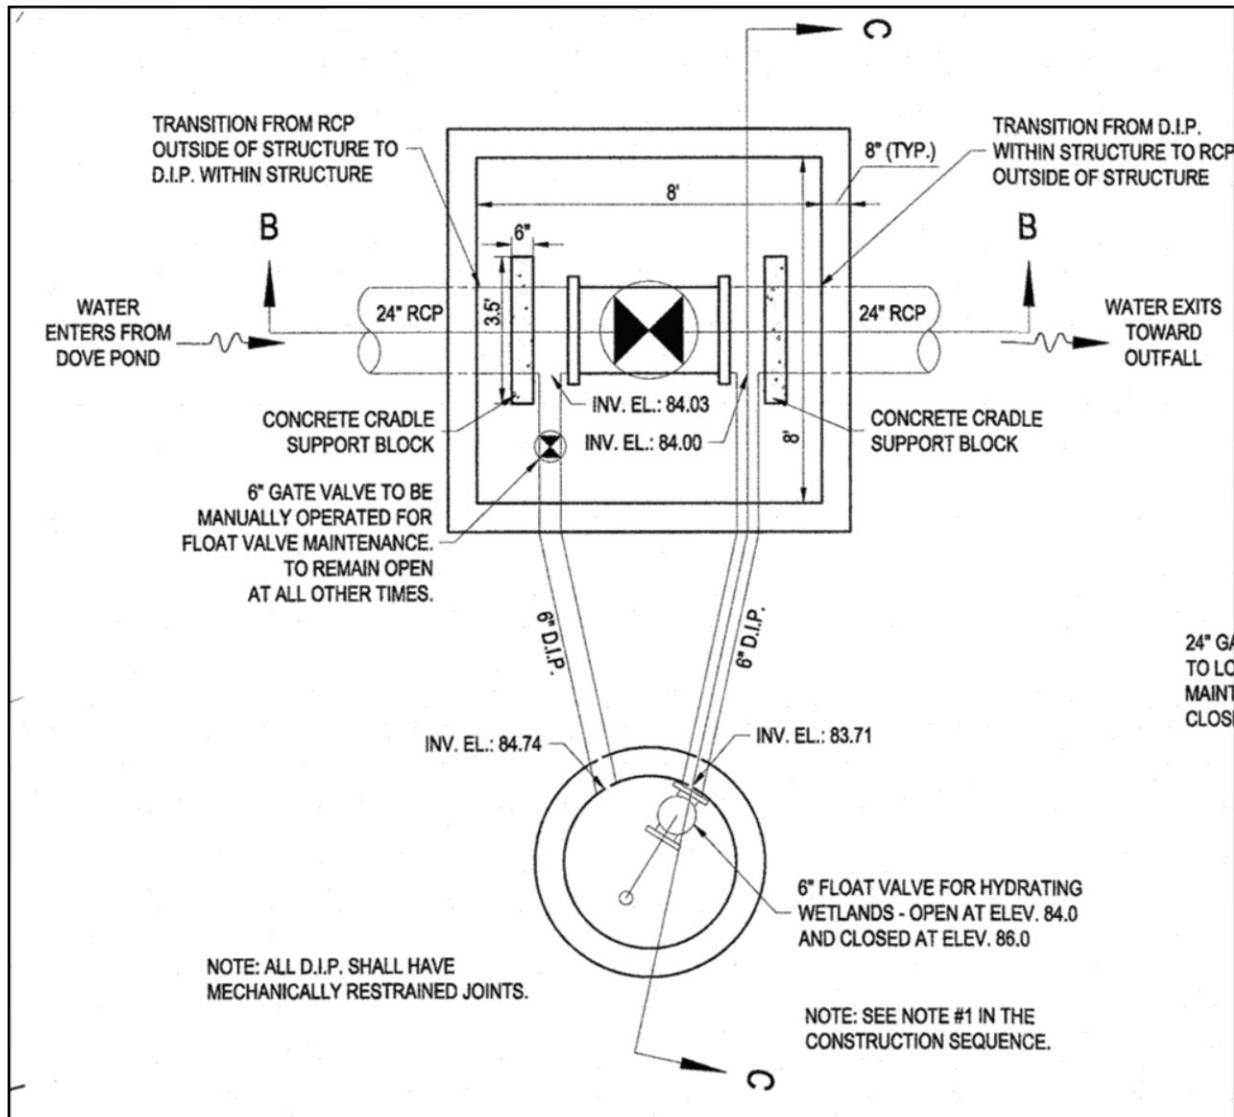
Valves in the Discharge Pipe through the Dove Pond Dam (Dove Pond Dam Construction Plans)
